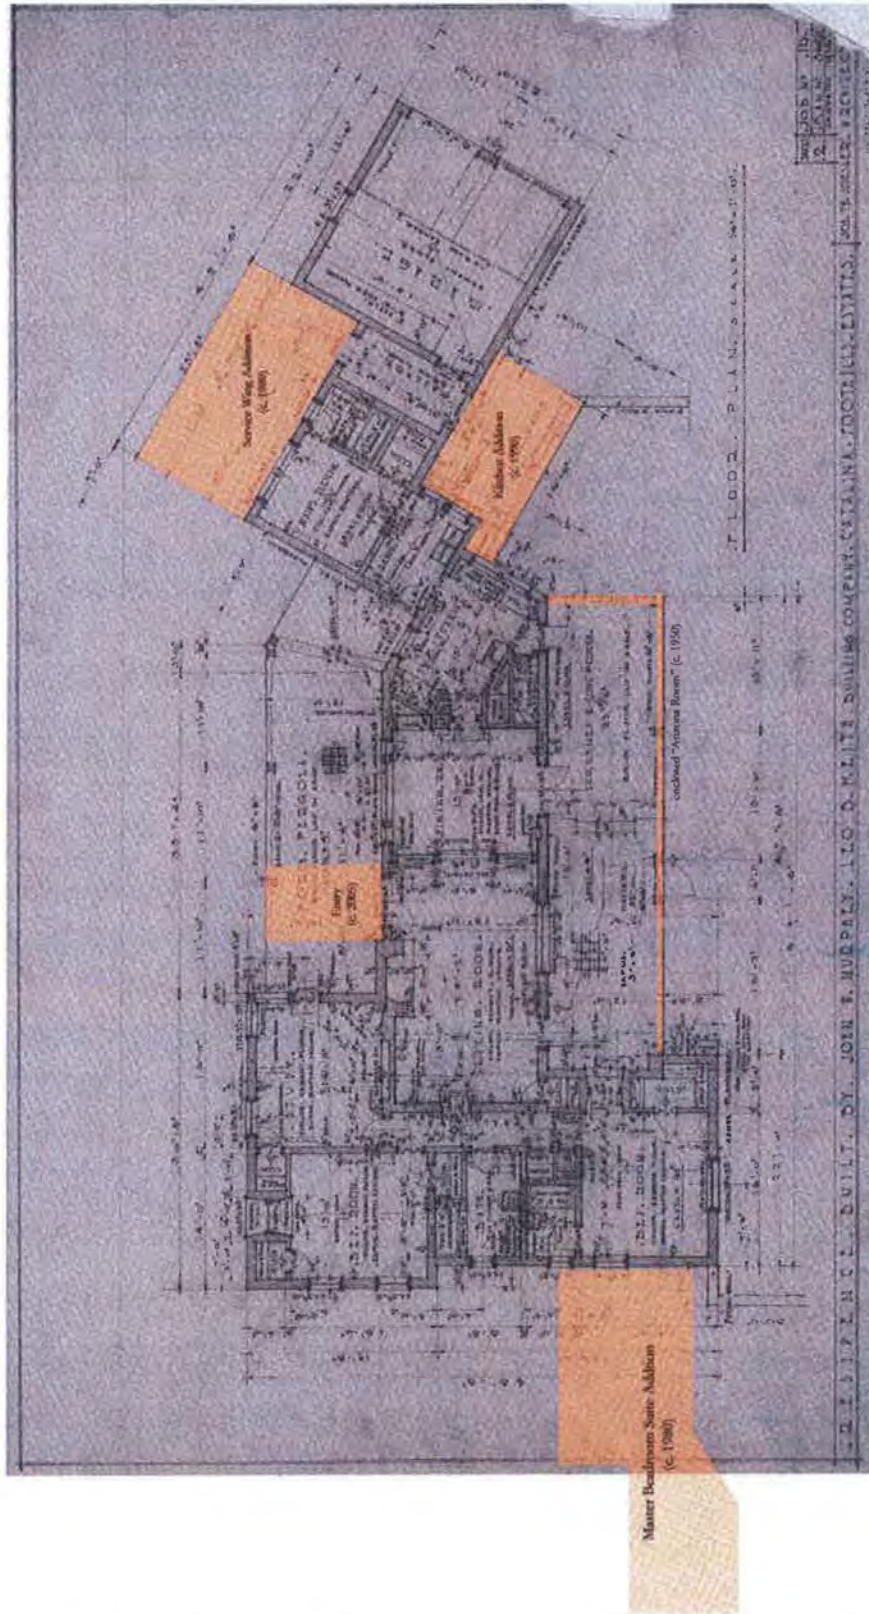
Additions to Craig House shown superimposed on original Joesler plan.
